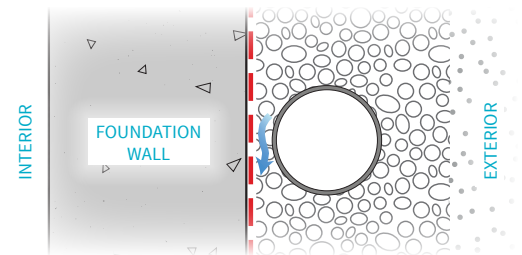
"Best practice" solid rain water leader drain pipe installation, supported by compacted backfill/gravel (section view).
